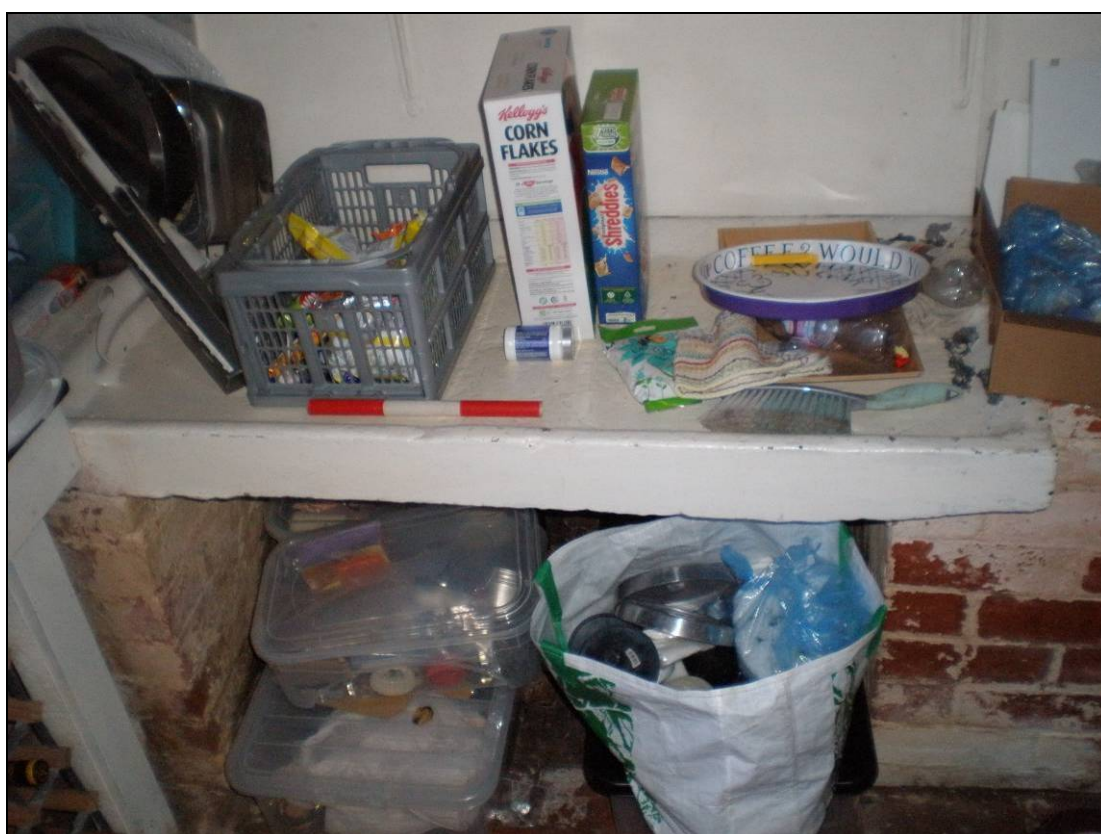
Detail of salting trough within the eastern end of room G-6 (scale 300mm)
